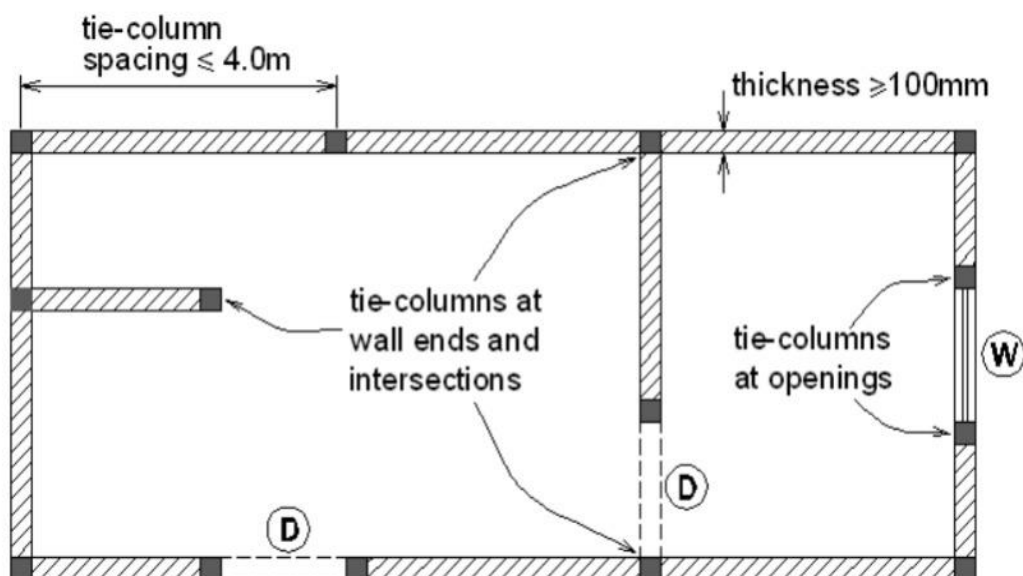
Floor plan sample showing the spacing and position of tie-columns
